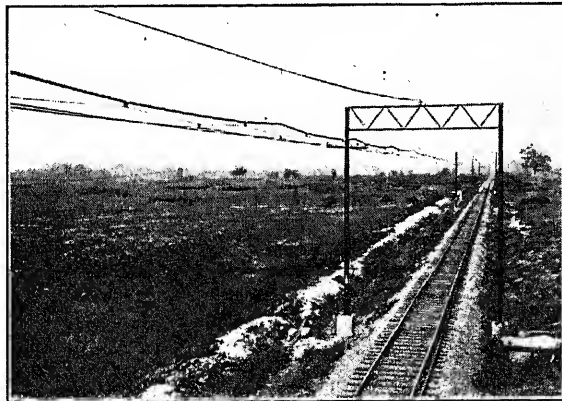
LACED SUSPENSION (OUTSIDE RAIL FOR TESTING WIDE GAUGE LOCOMOTIVES)
